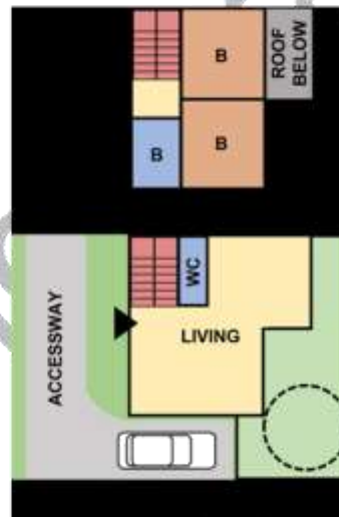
Example of a double-storey, two-bedroom dwelling without a garage.
